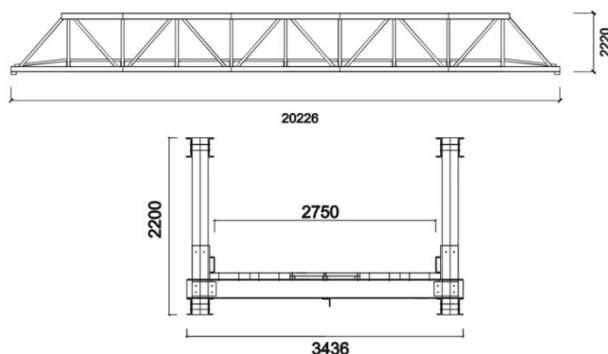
Longitudinal elevation and cross-section of the bridge (dimensions in mm). Source: [8].
